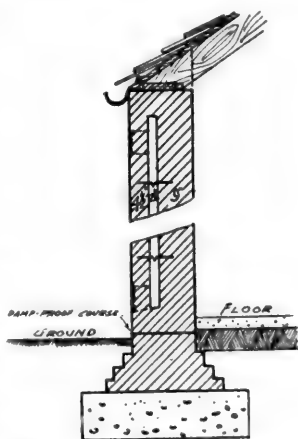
Section of hollow brick wall with ventilation of cavity by gratings. Ties through cavity and the footings and damp-proof course are shown.
